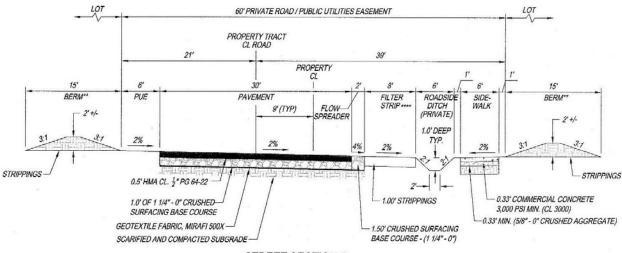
Street Section B: Water Quality Filter Strip with Private Road Section
